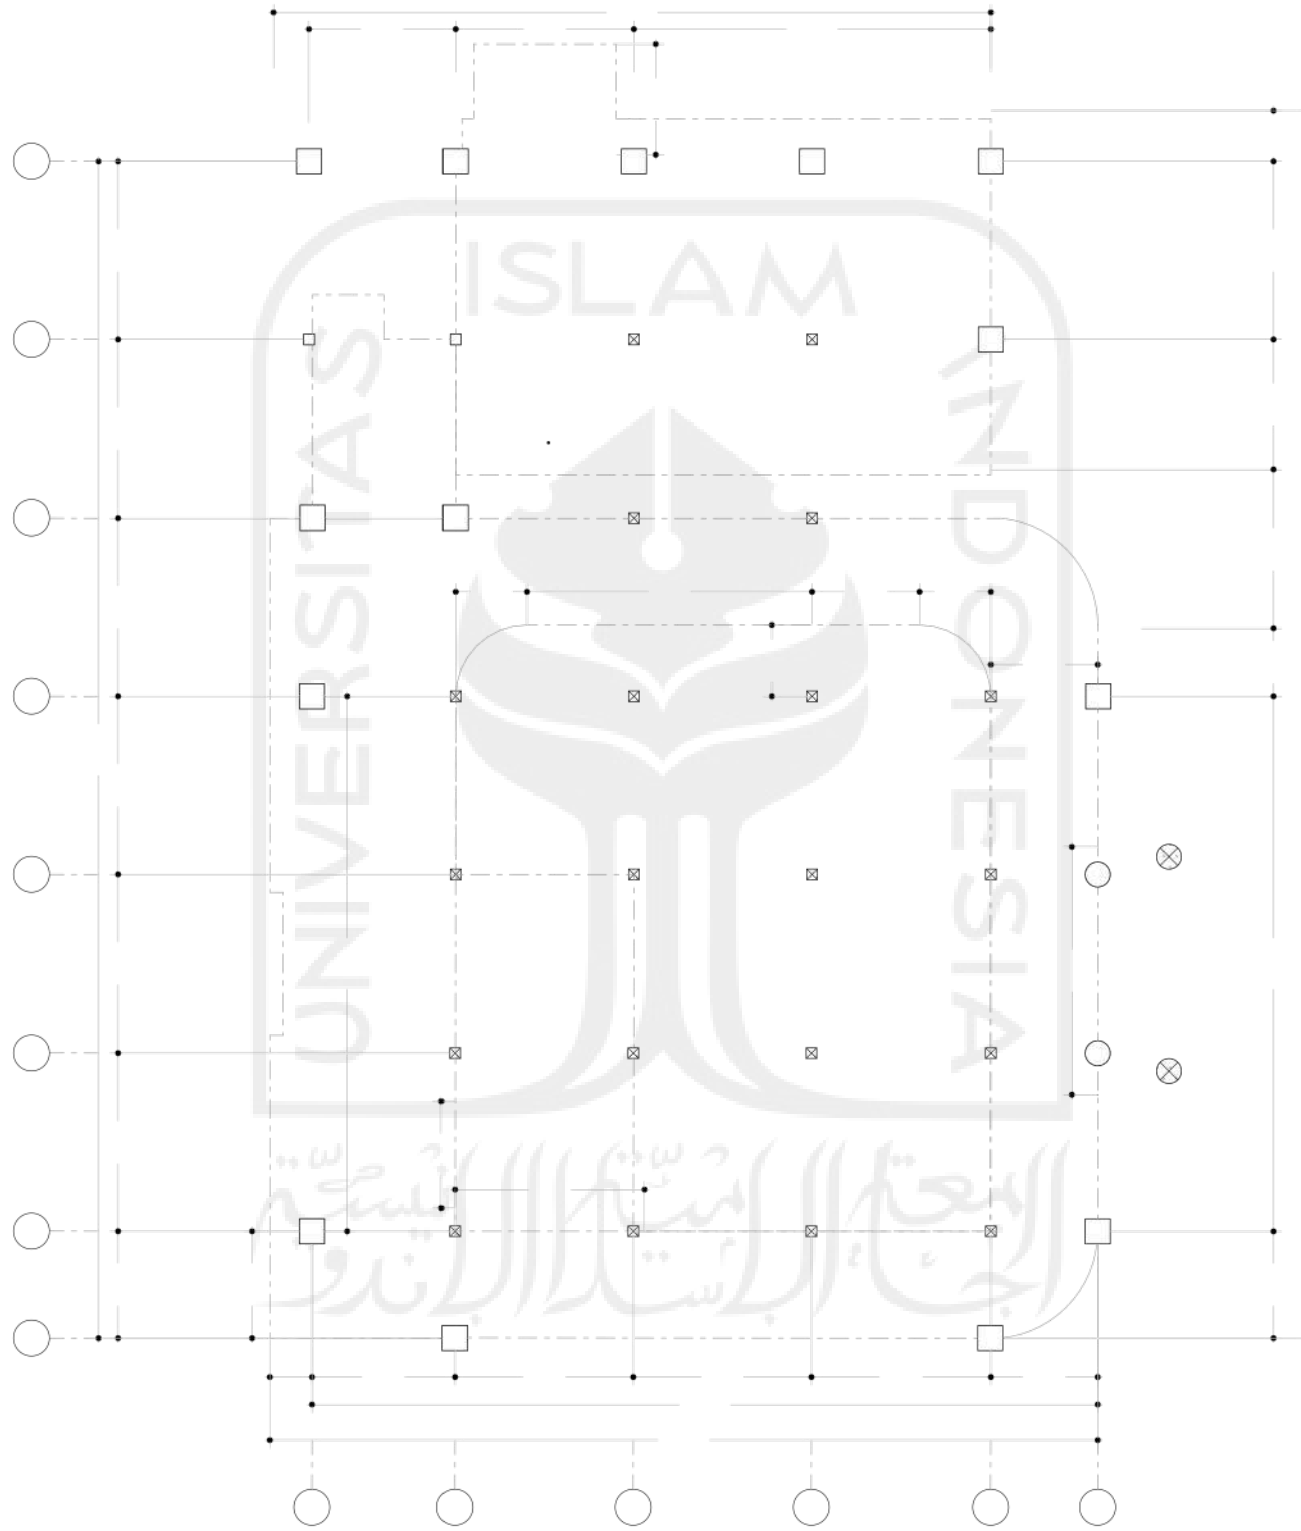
# DETAIL FLOOR PLATE 1ST FLOORS (BUILDING B1)
